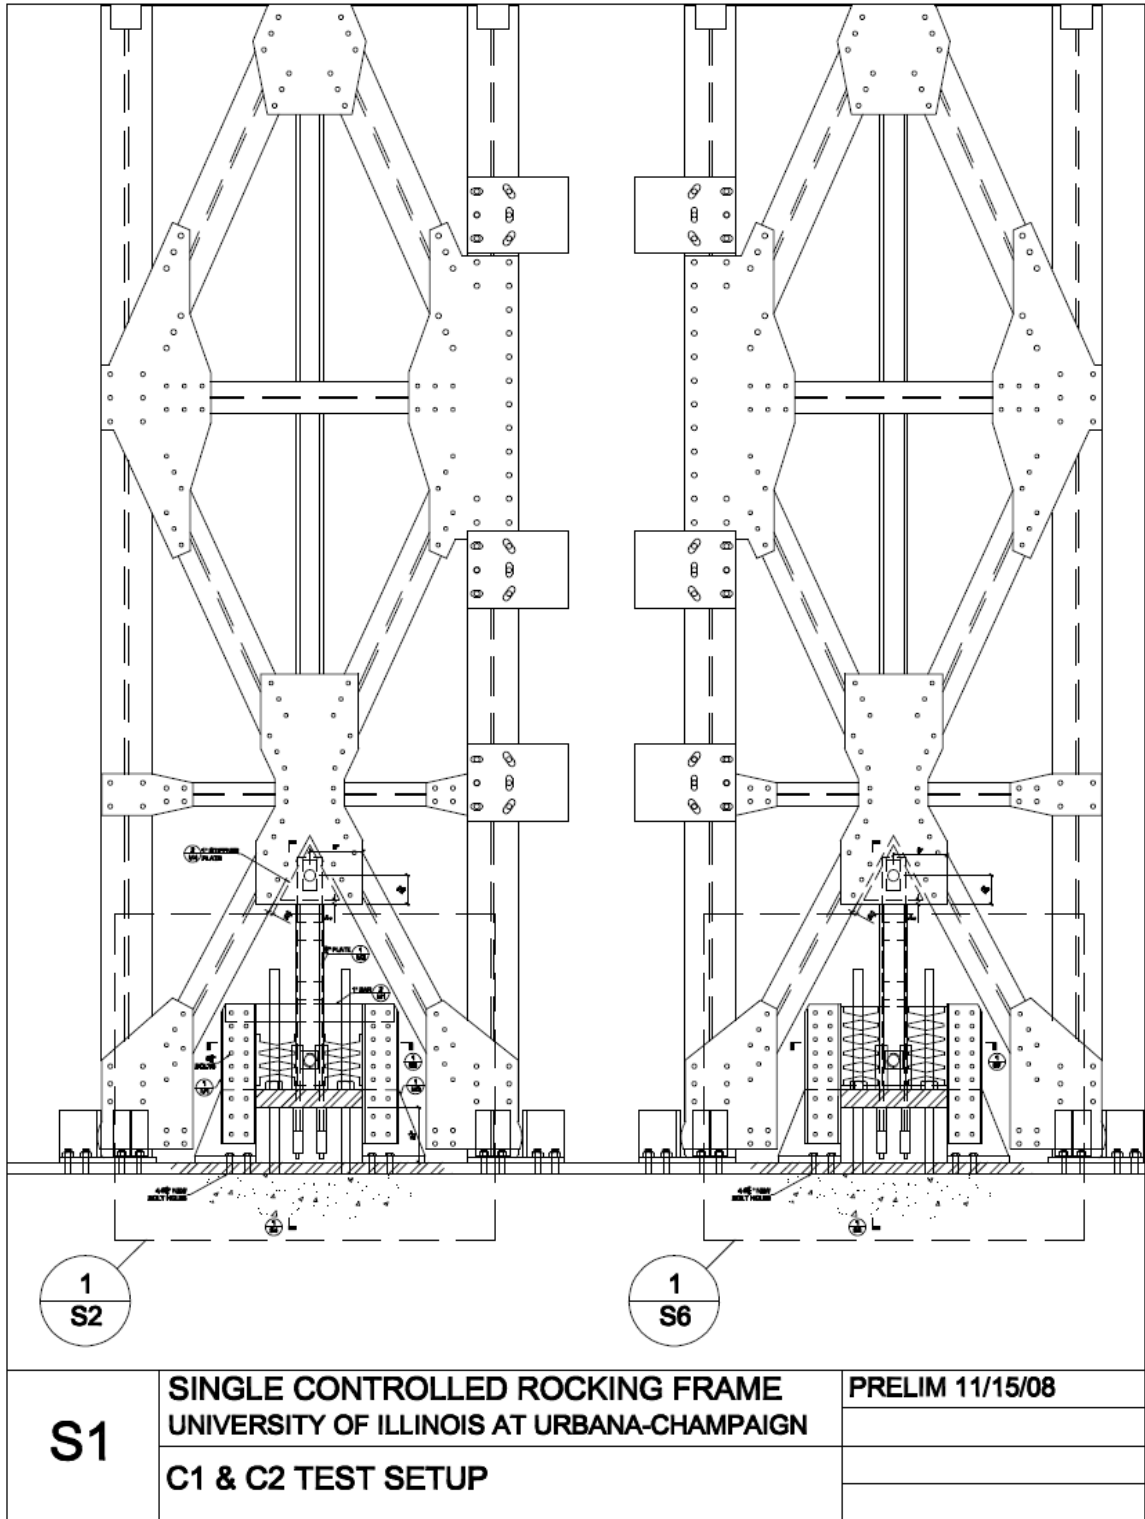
Design Drawing for the Single Frame Configuration – Elevation View
